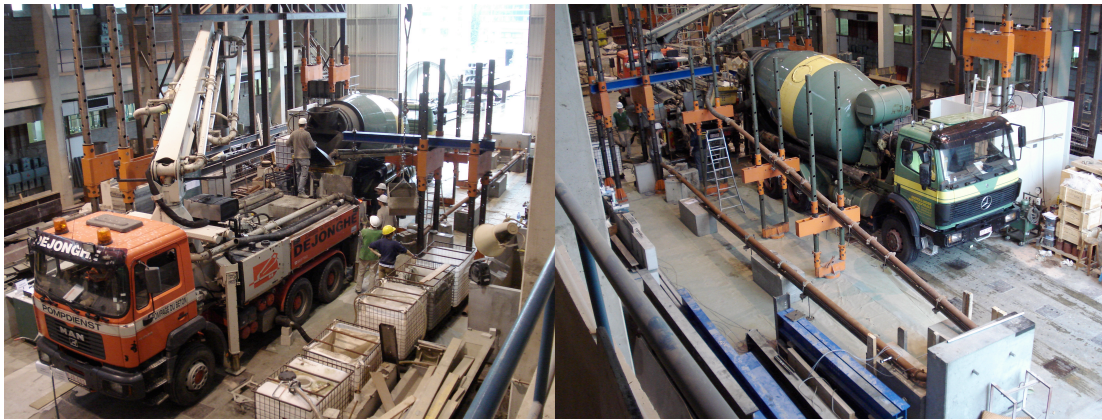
Left: concrete piston pump truck. Right: Piping circuit.
